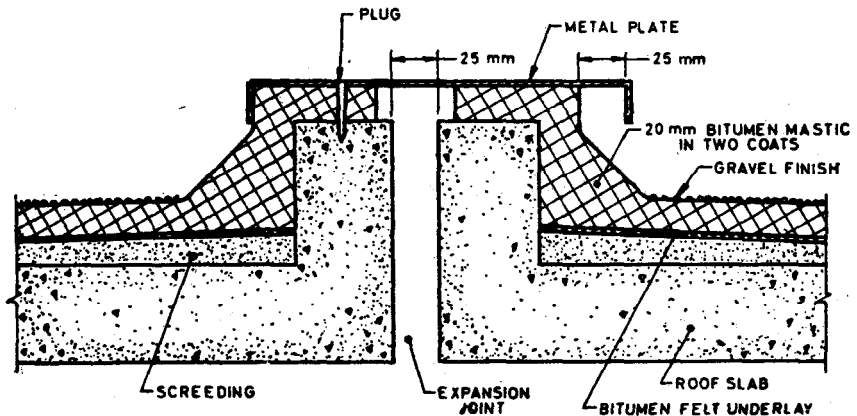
EXPANSION JOINT IN FLAT ROOF TWIN KERB TYPE
